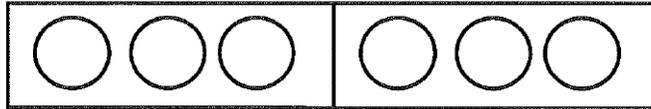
Reinforced Concrete / Pre-stressed Concrete Voided Slab
